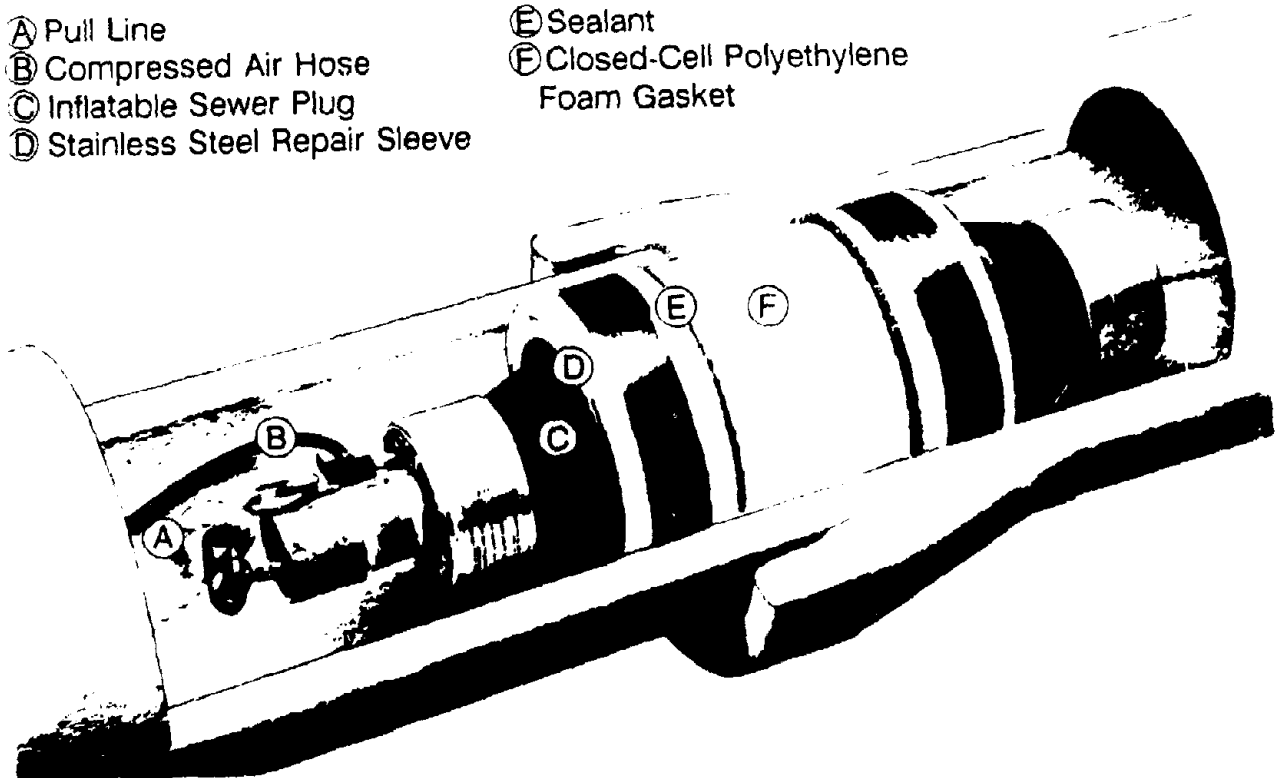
Cut-away drawing of the liner system and installation equipment.⁽²⁾
